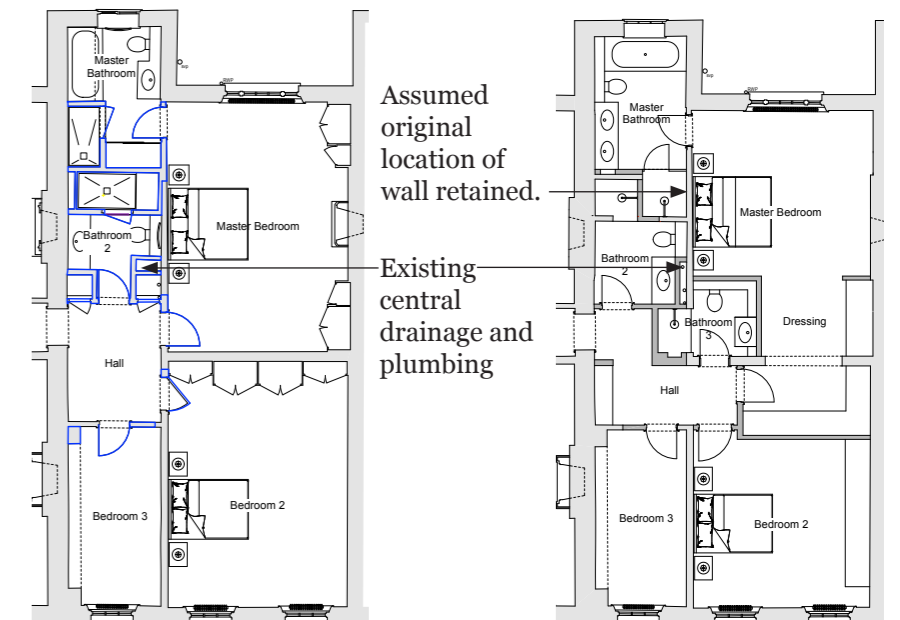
Existing Floor Plan with modern, post 1949 partitions shown in blue.
